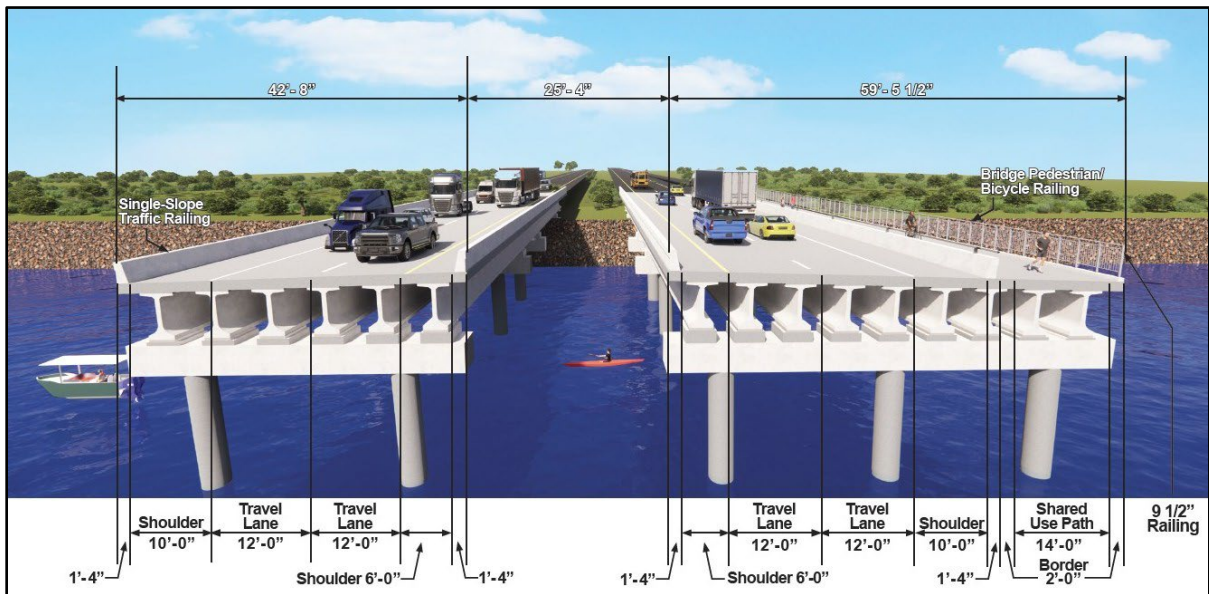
Proposed Kissimmee River Bridge typical section.
